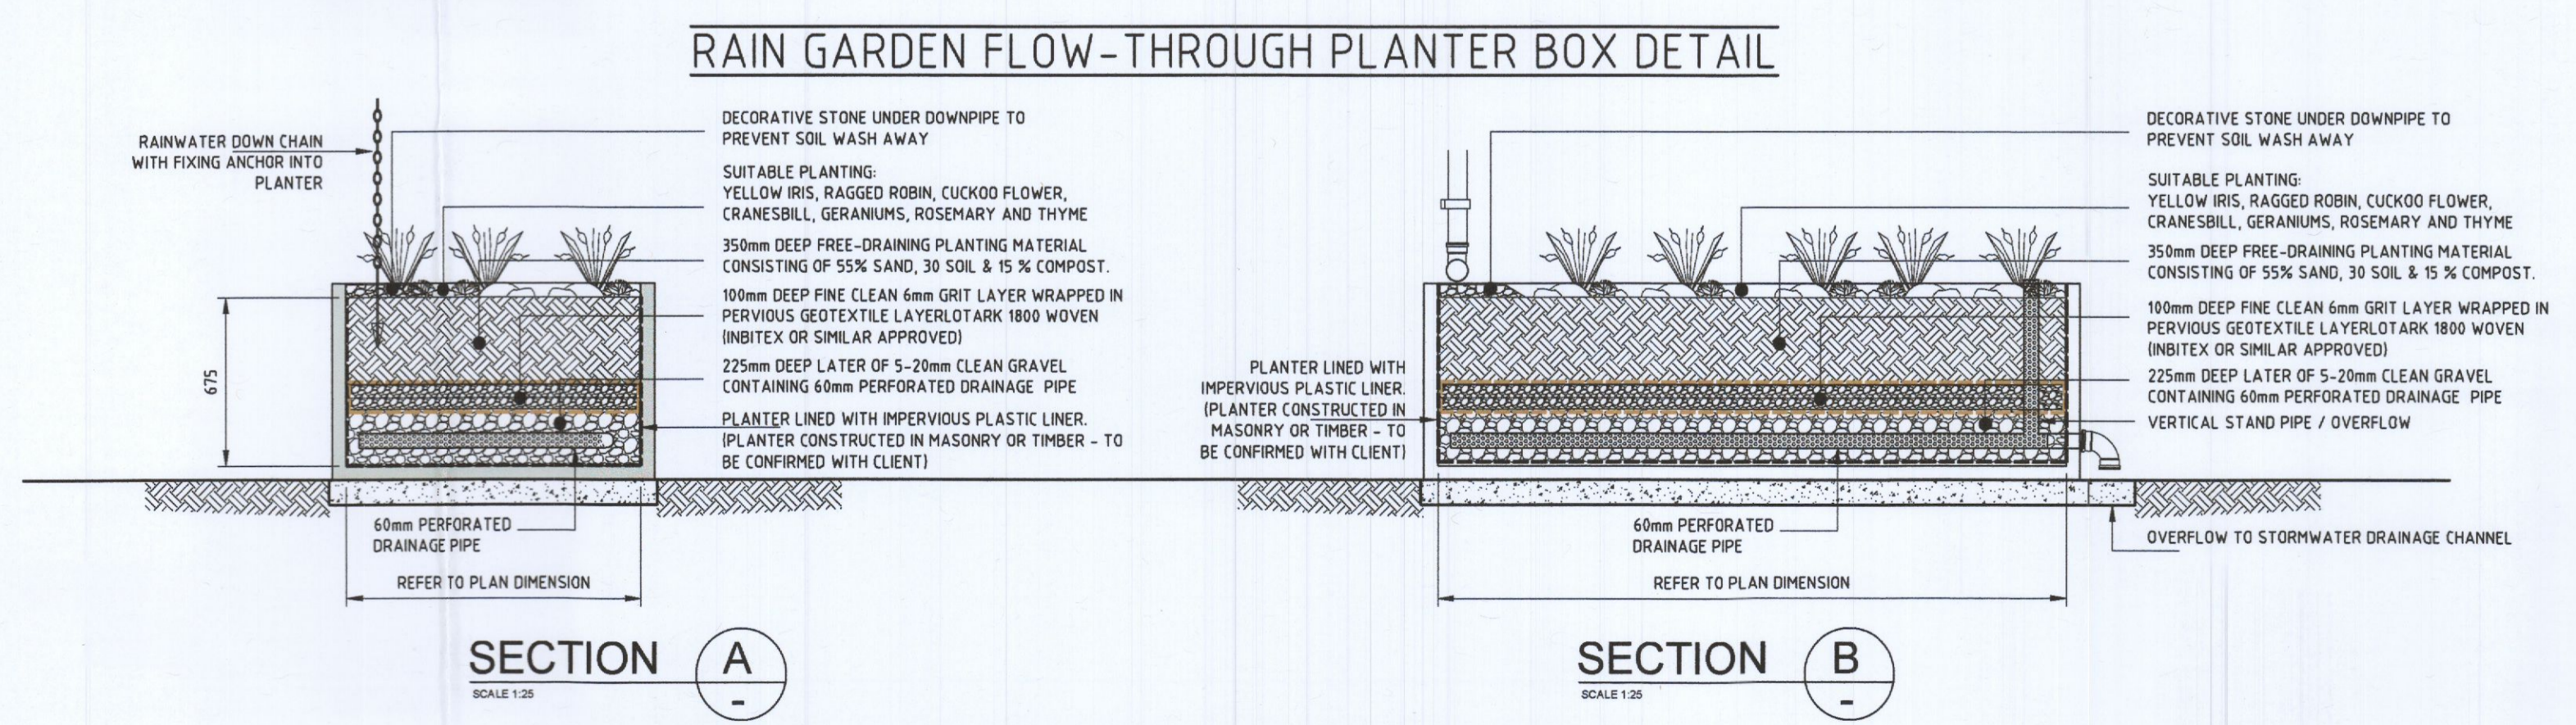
IMAGE EXAMPLE OF RAIN GARDEN PLANTER BOX DETAIL
